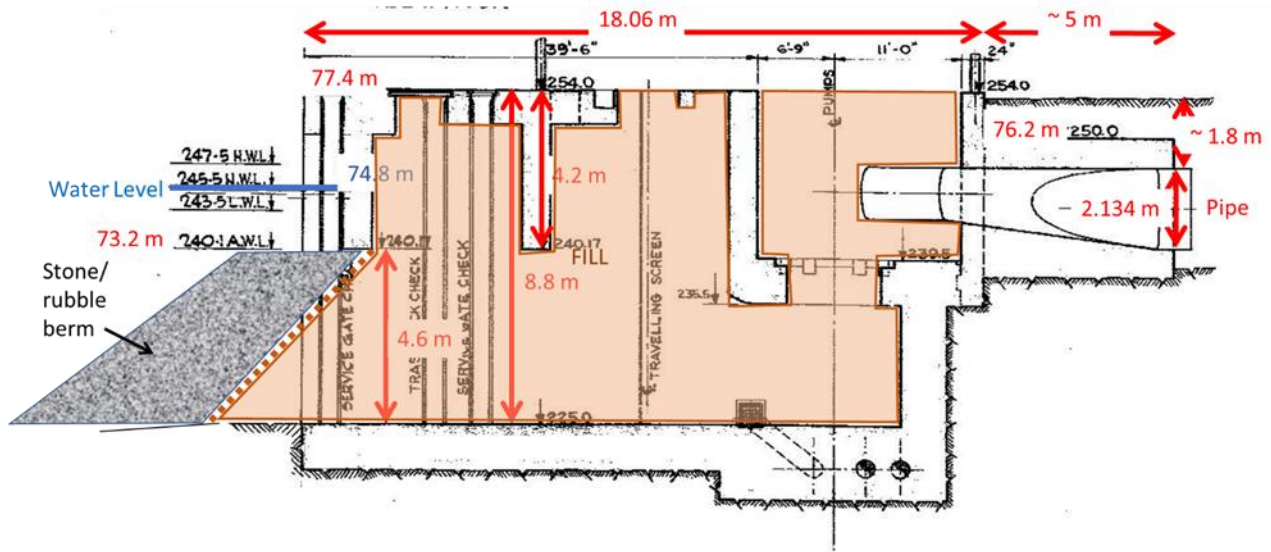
Concept to buttress rubble fill at Pumphouse intakes with added stone/rubble berm
